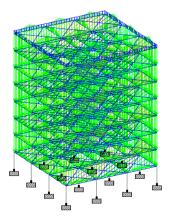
Assining of Parapet Wall Load Load (3.84KN/m)
